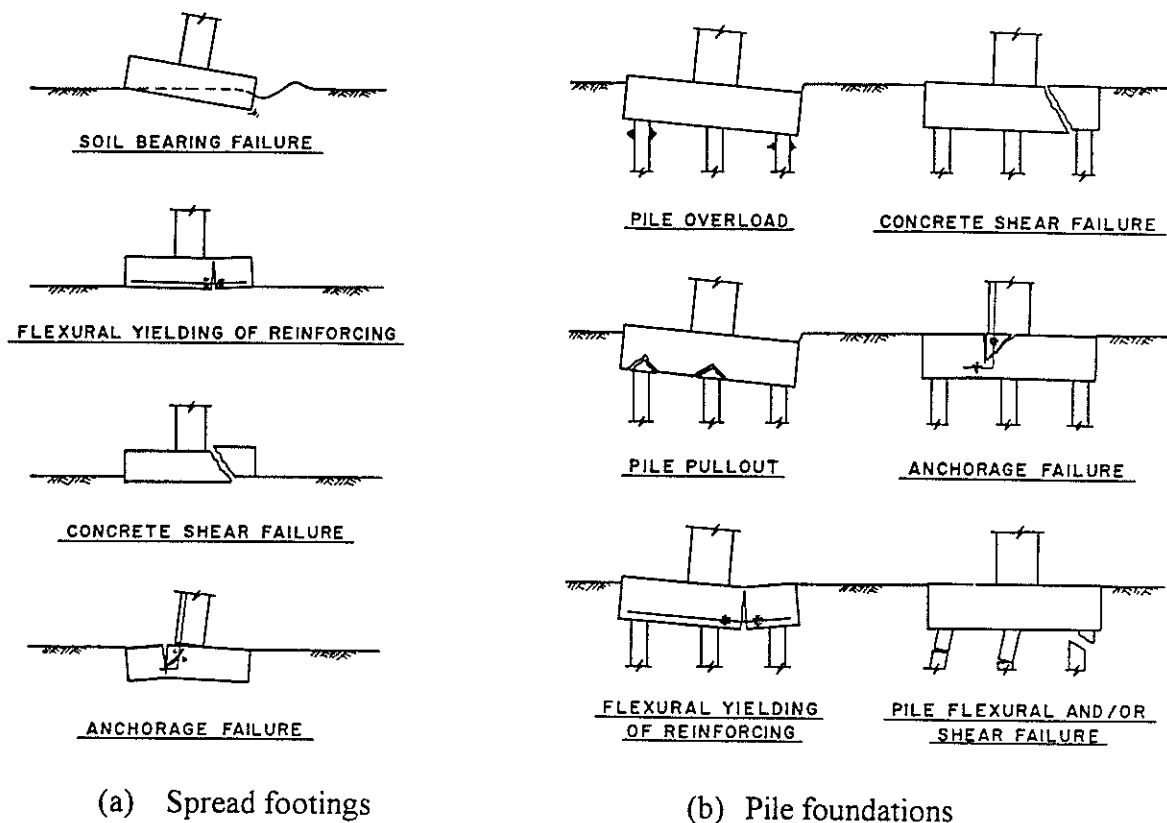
Possible seismic failure modes for bridge foundations (ATC 1983).
